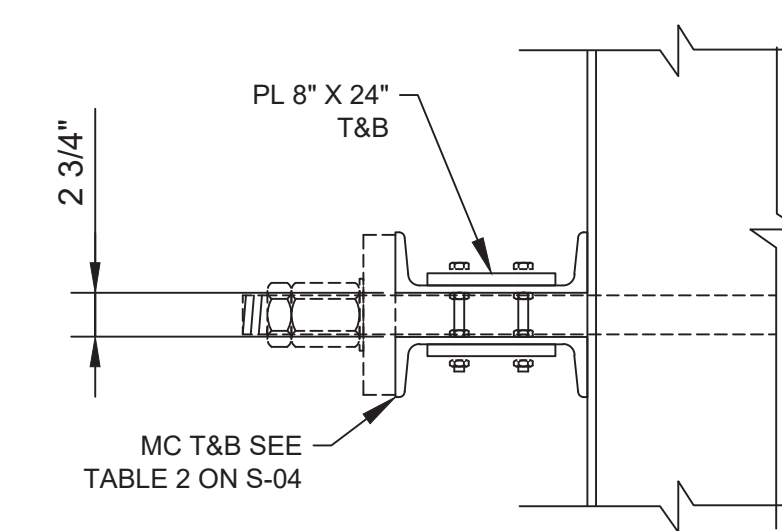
CORNER CONNECTOR ALTERNATIVE B
